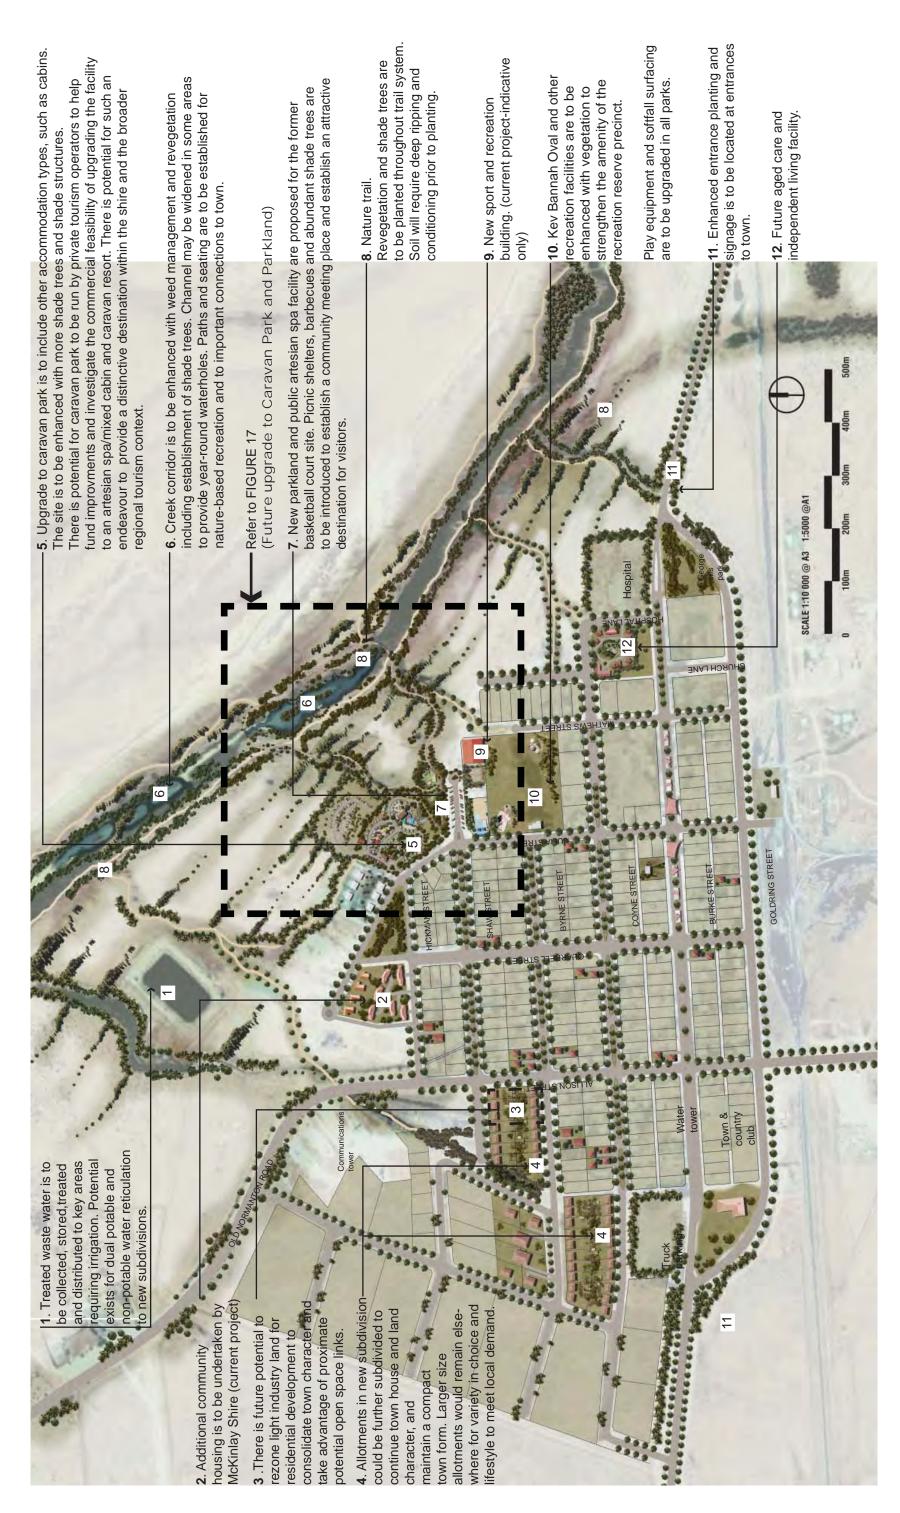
JULIA CREEK Town Infrastructure Master Plan
